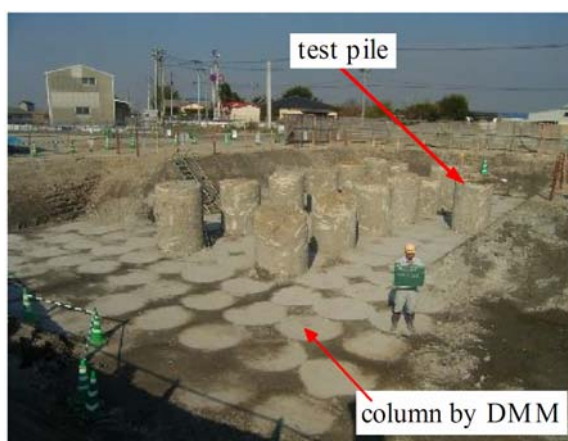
CAST-IN-PLACE PILES IN A COMPOSITE GROUND FOUNDATION
